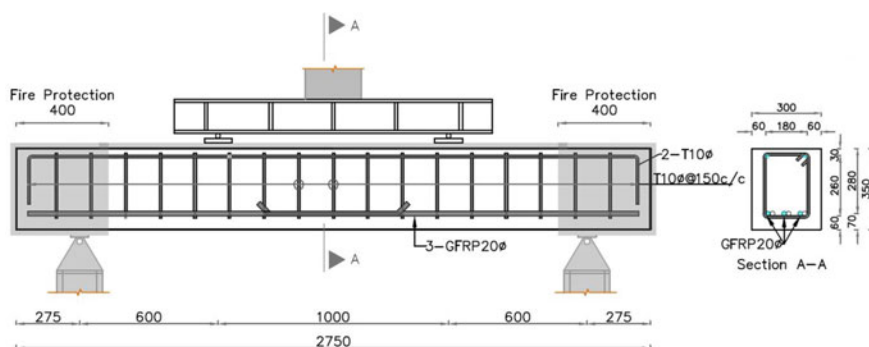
Dimensions and reinforcement details of a typical concrete beam
